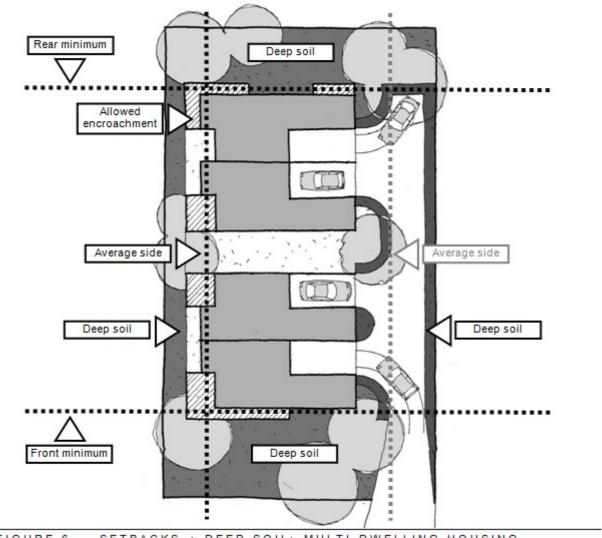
SETBACKS + DEEP SOIL: MULTI DWELLING HOUSING Indicative site plan for developments with above-ground parking
